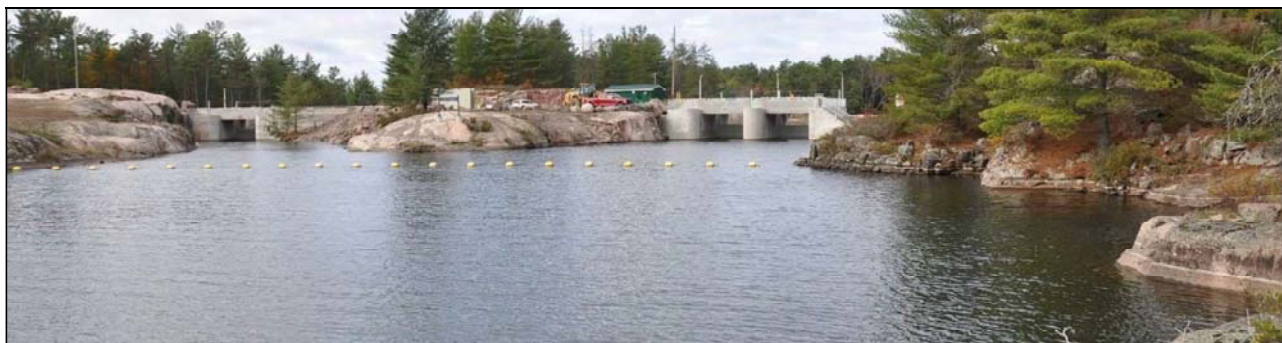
Big Chaudière Dam with new structures (South Dam on left of photo; North Dam at right) showing location of existing waterway barrier. View looking downstream. New waterway barrier to be slightly upstream (i.e. closer to the foreground in this photo).
